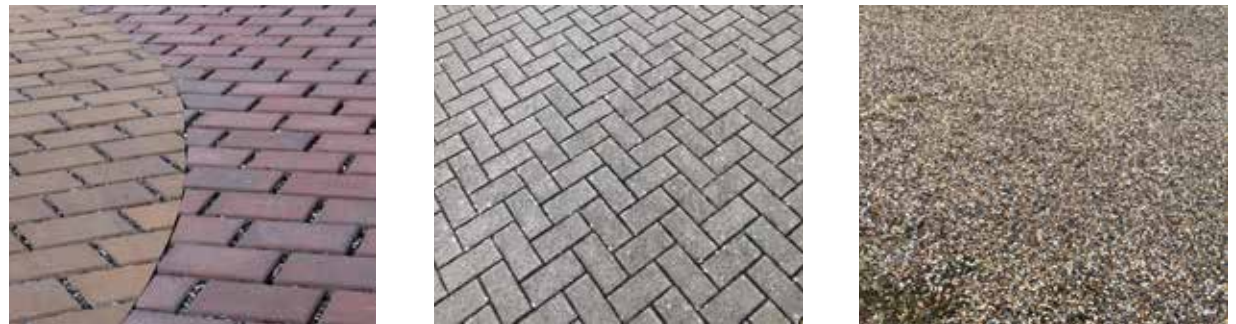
Examples of permeable paving treatments: unbound clay pavers (left), precast concrete setts (centre), and gravel (right).
